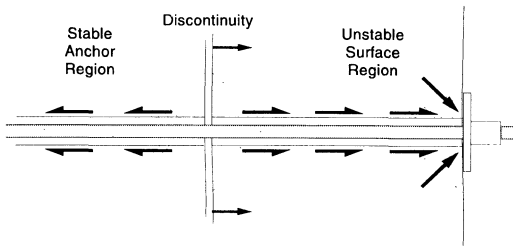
Schematic diagram showing the load transfer concept for a rock reinforcement system.
